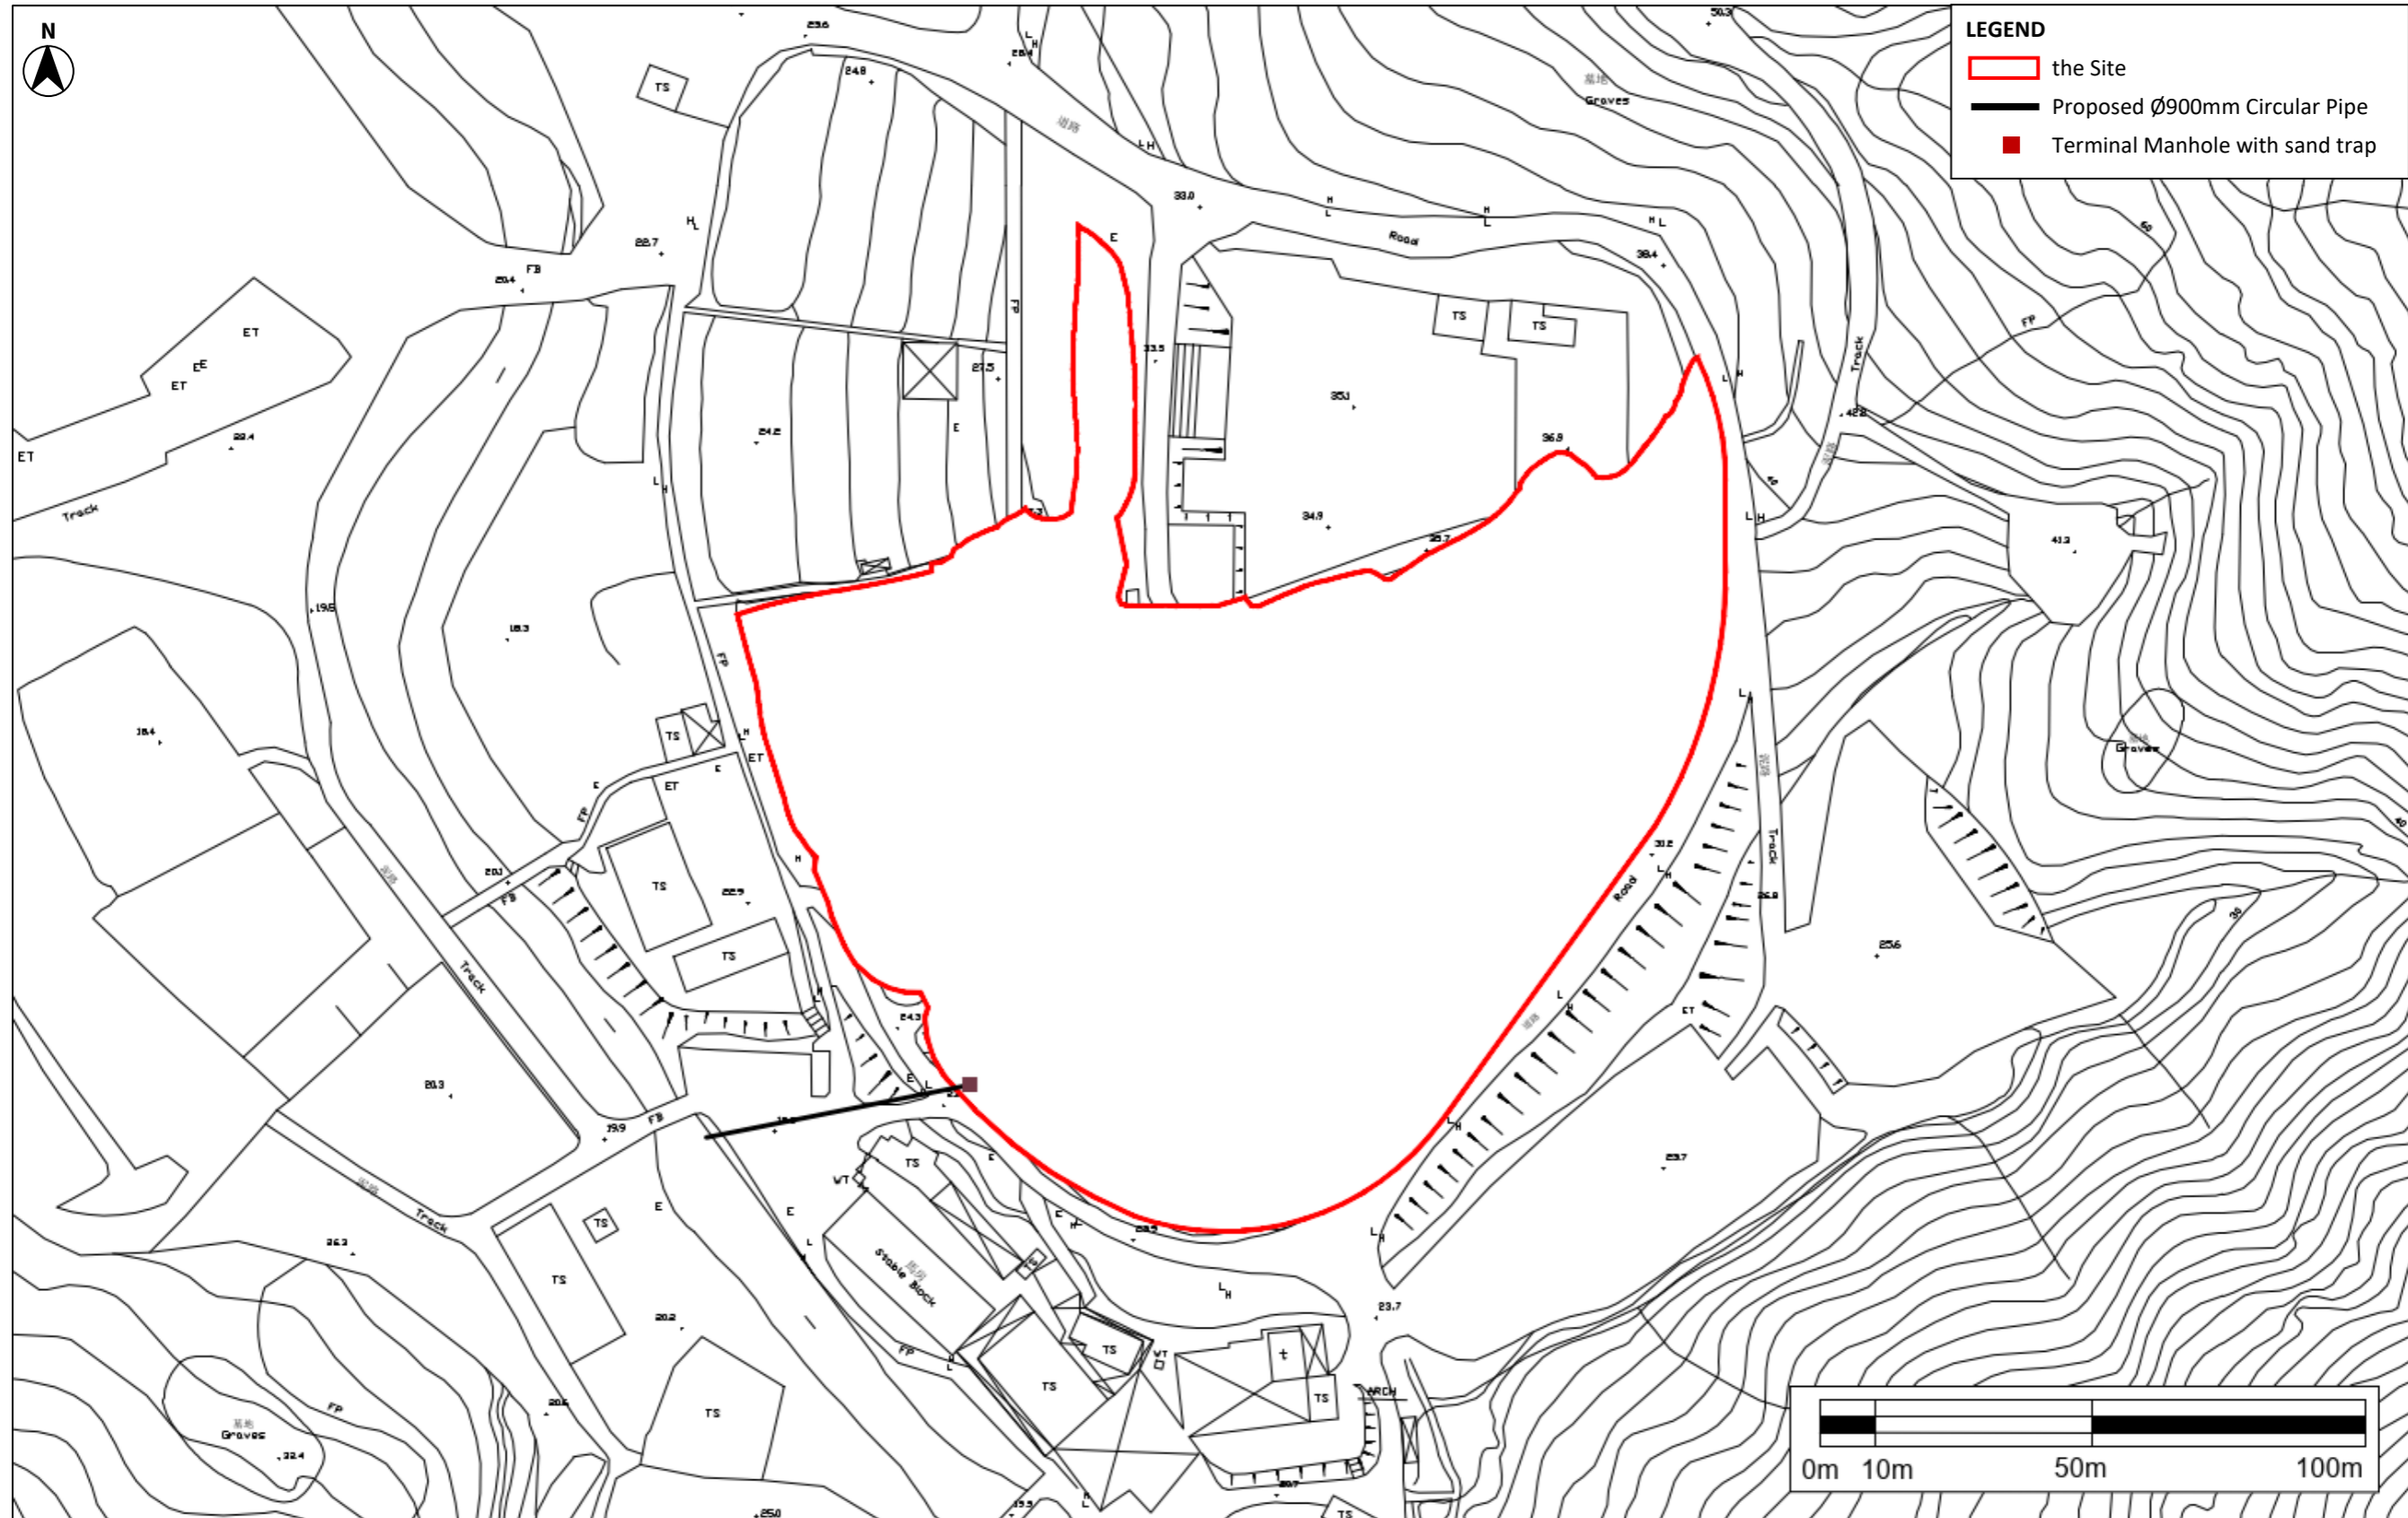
Indicative Location of Proposed Terminal Manhole and Stormwater Pipe
